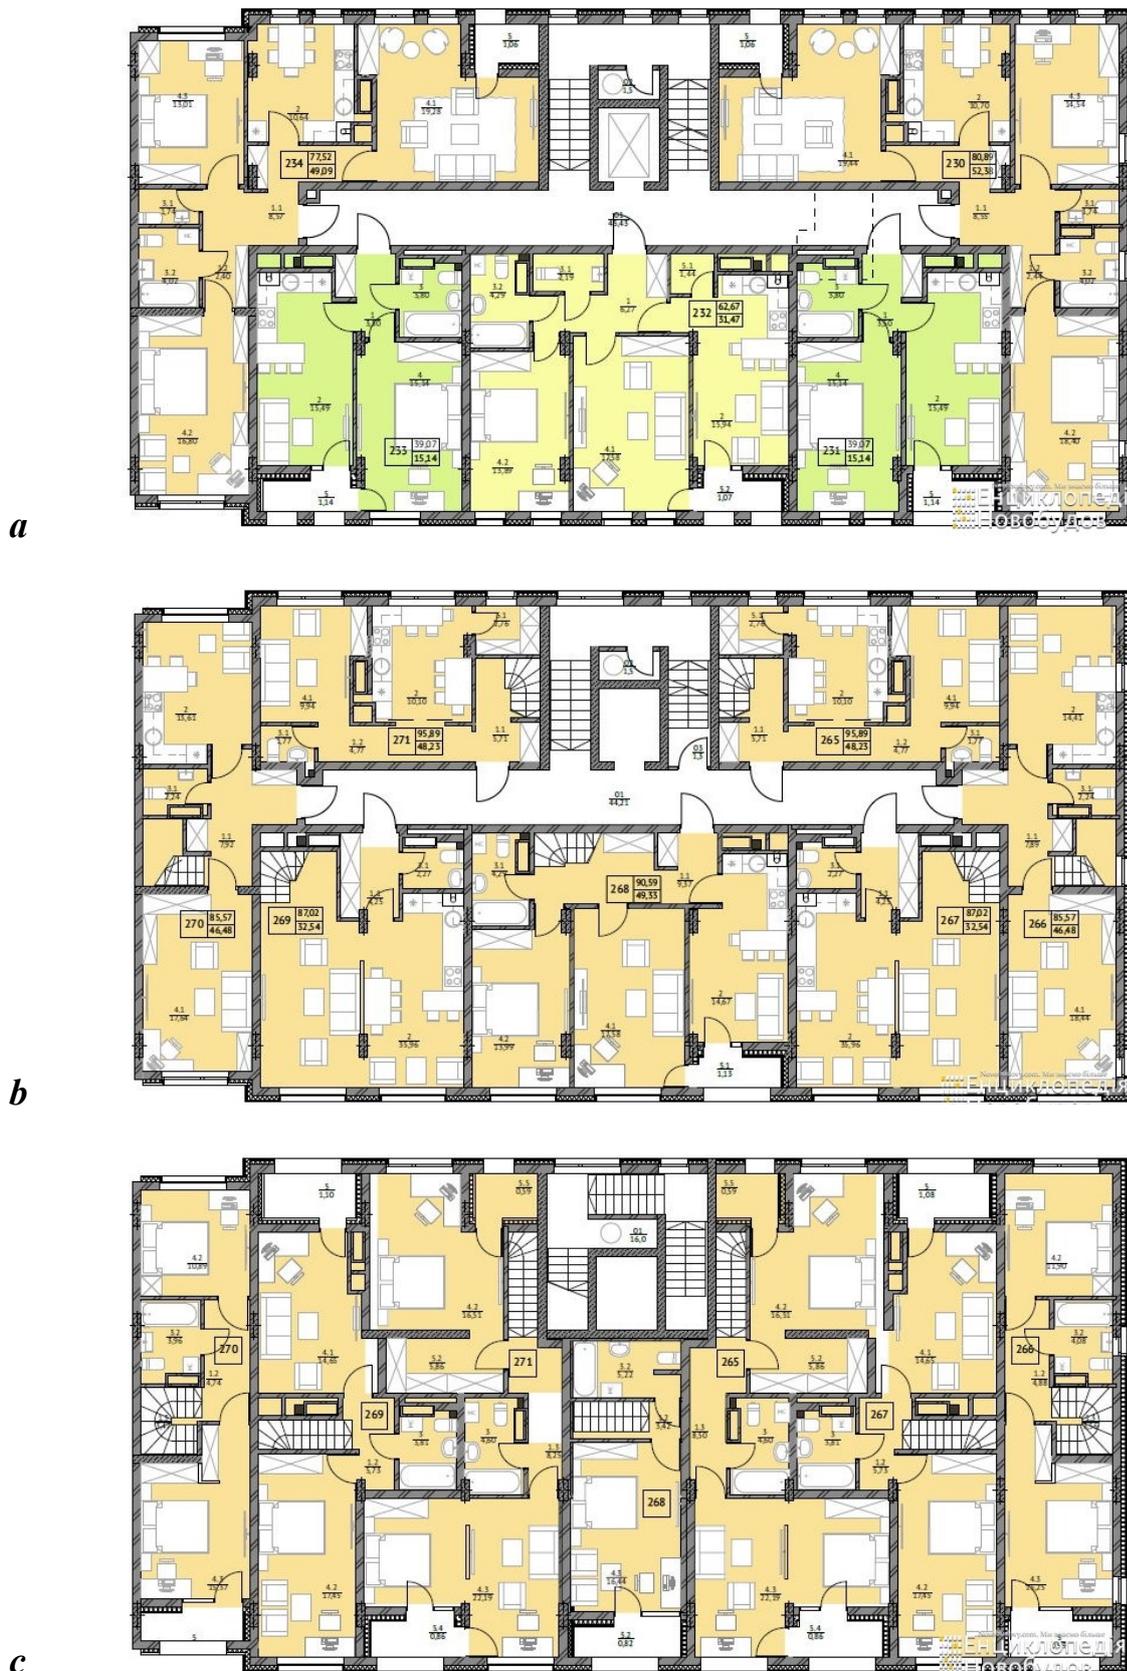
An example of a 9-10-story residential building with apartments on one (a) and two levels (b, c). Floor plans. Residential complex “Yaskravyi Lviv” (“The Bright Lviv”), Lviv, Ukraine [26]
